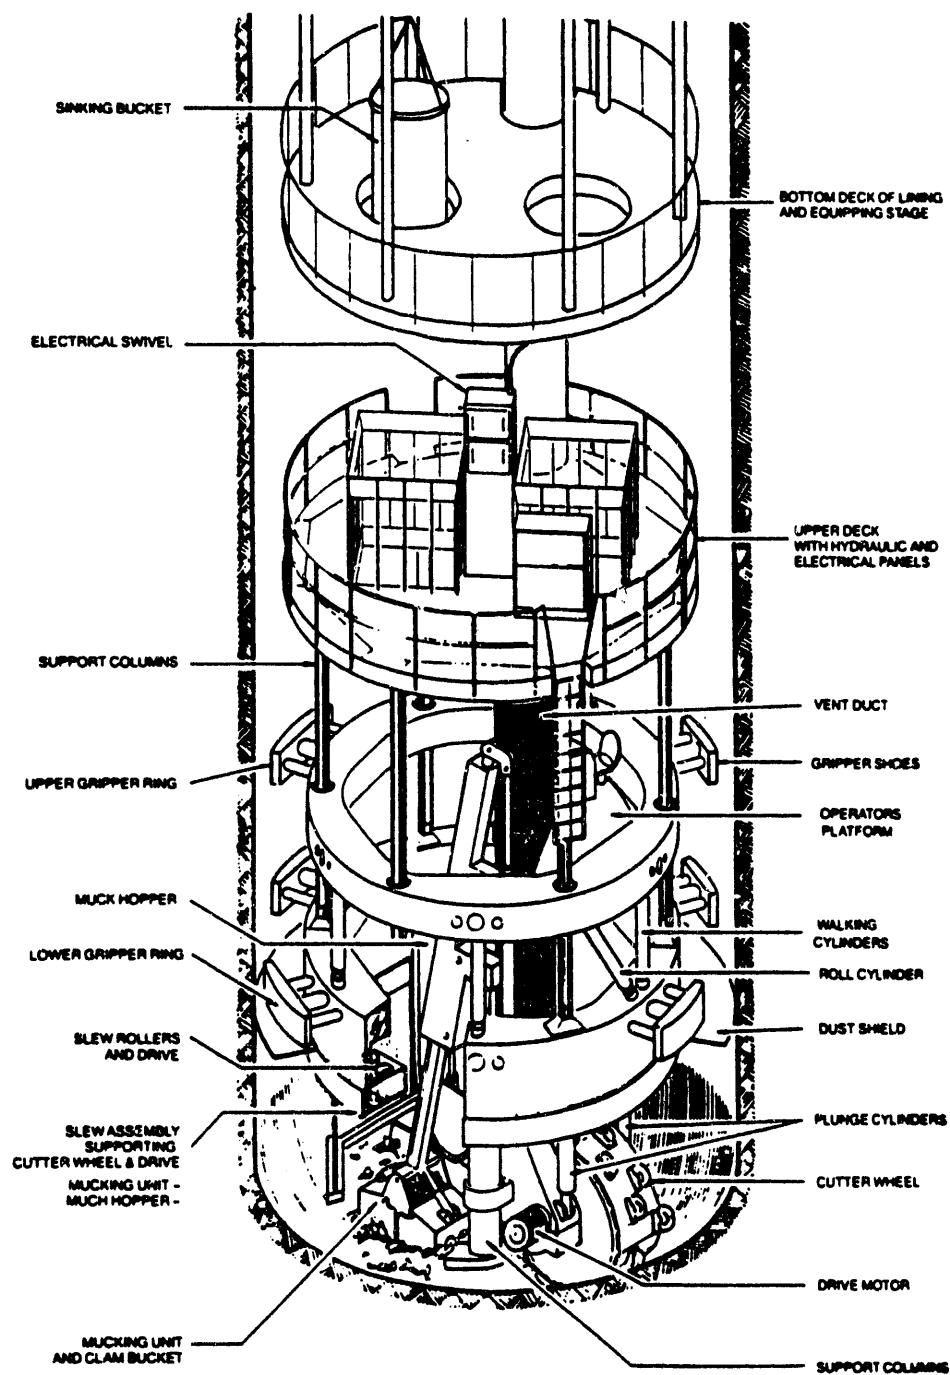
Schematic Drawing of a Vertical Wheel Shaft Boring Machine (SBM), Courtesy of The Robbins Co.
